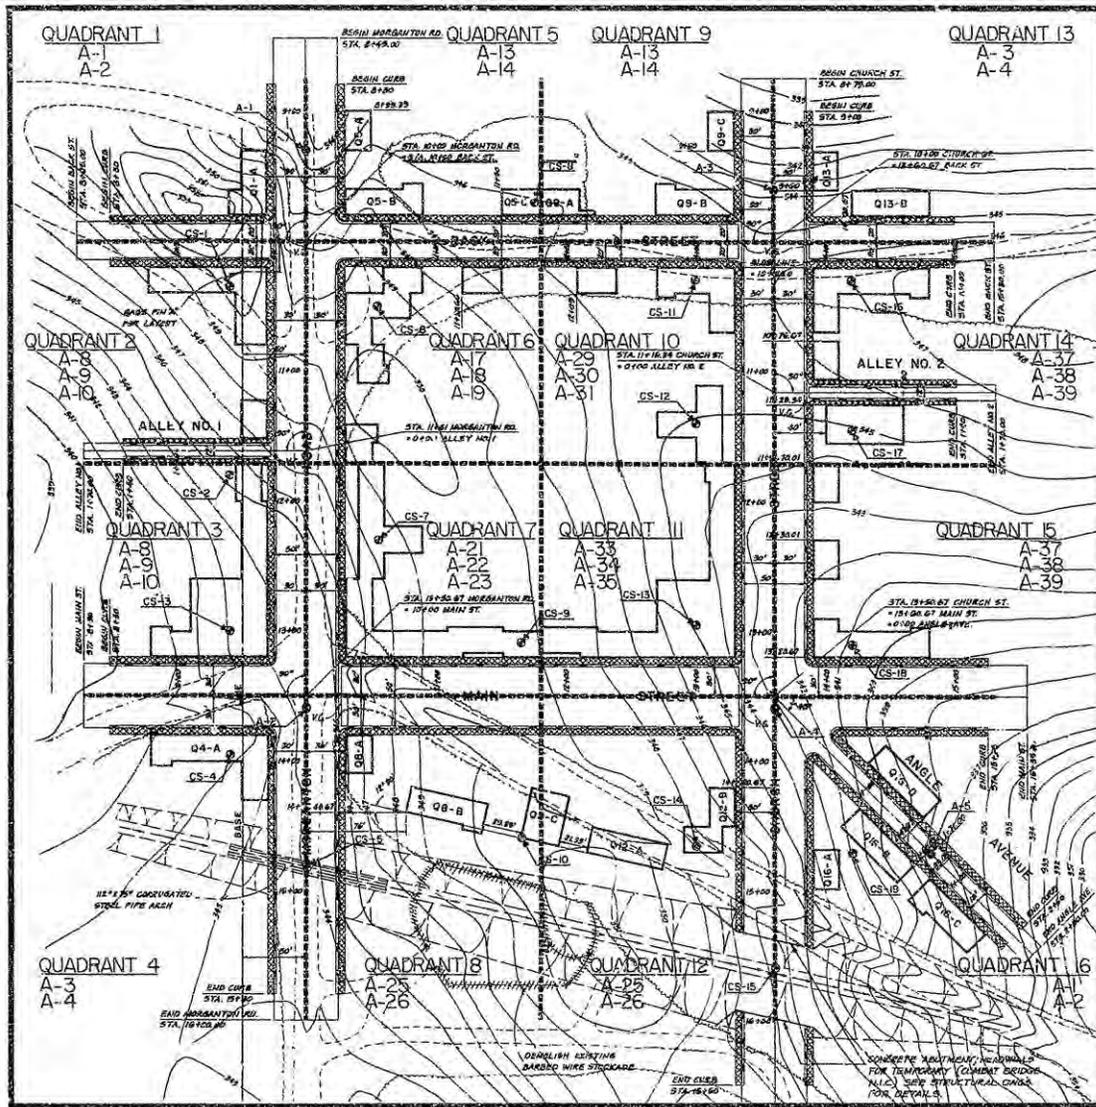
MOUT building location plan, Fort Bragg, NC, 1981 (CON28-09-04 sheet 2 of 55; military operations in urban terrain, building location plan and index of drawings; 8 June 1981).
